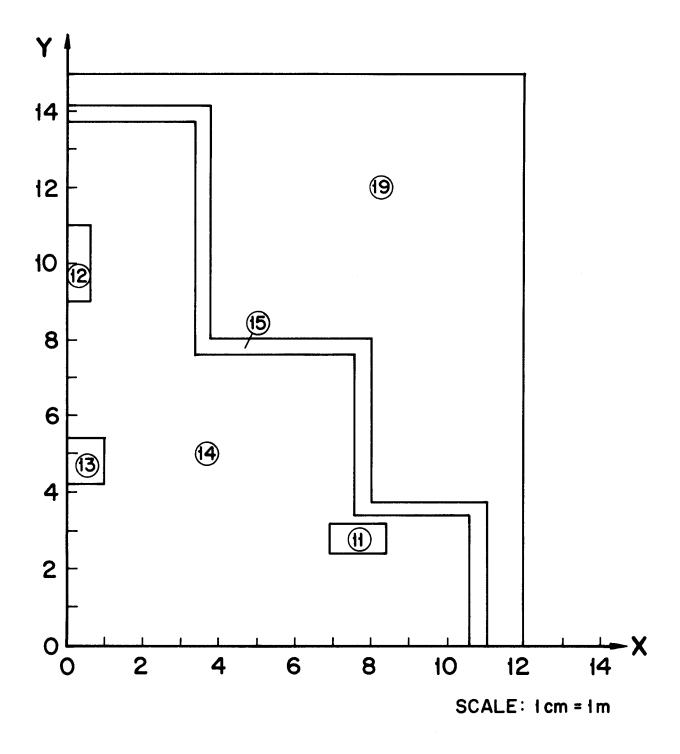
Horizontal cross section at 3.5 m above basement floor.
